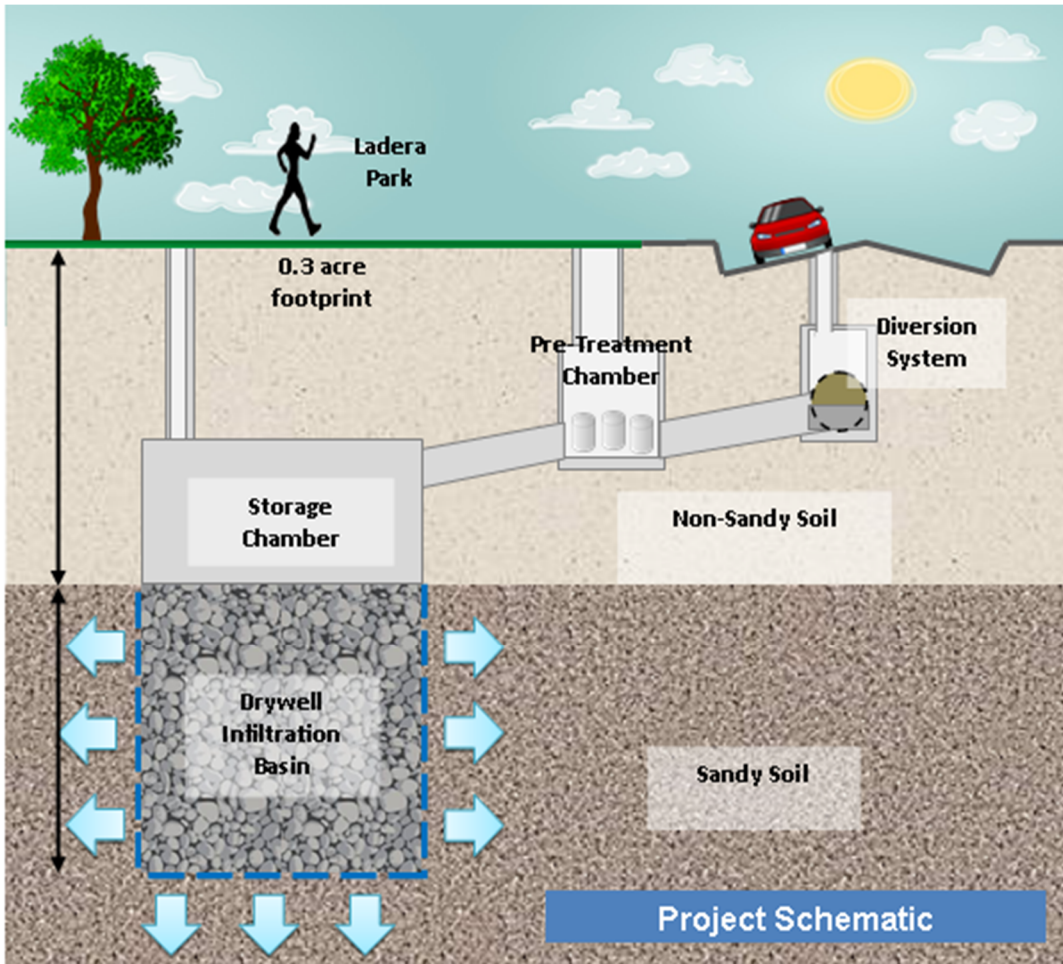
Ladera Park Field Subsurface Infiltration Site – Preliminary Concept Design
